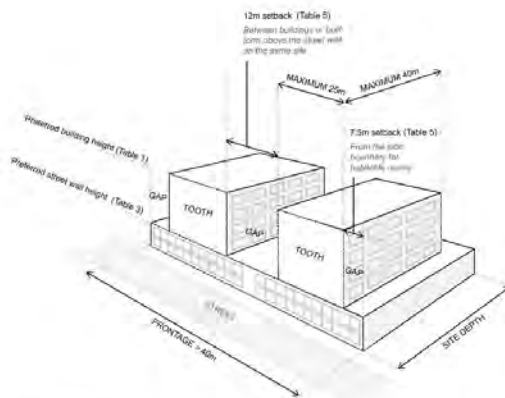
Example tooth and gap development - showing non-residential uses to the street wall and residential uses above
